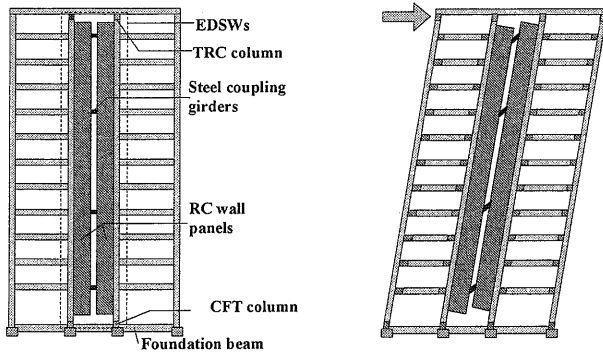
Plan of structure A – EDSWs and its collapse mechanism
